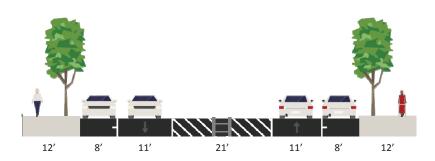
Polk Street Typical Cross-Section, between Florida Avenue and Franklin Street
